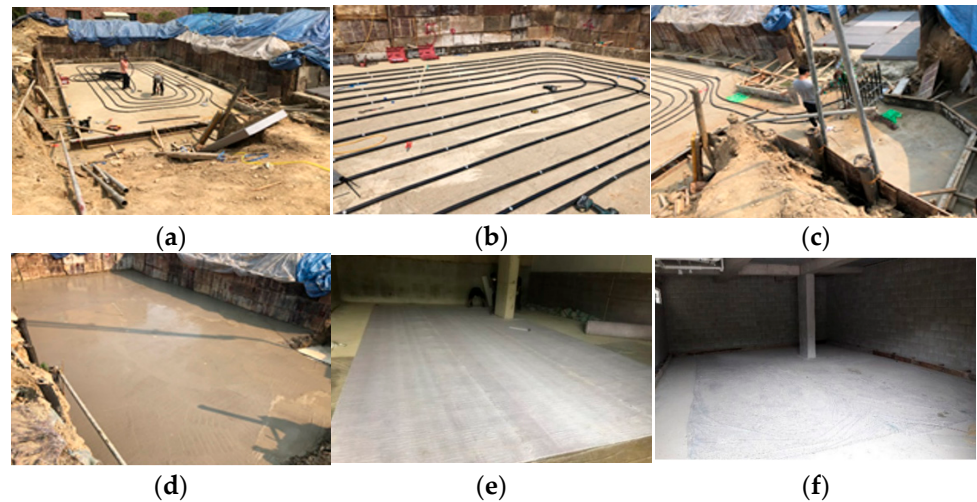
Construction procedure of floor-type energy slab. (a) Arrangement of heat exchange pipes. (b) Fixing heat exchange pipes. (c) Connection of supply and return pipe. (d) Placement of concrete on floor slab. (e) Installation of aerogel-type thermal insulation. (f) Placement of concrete to adjust leveling.
